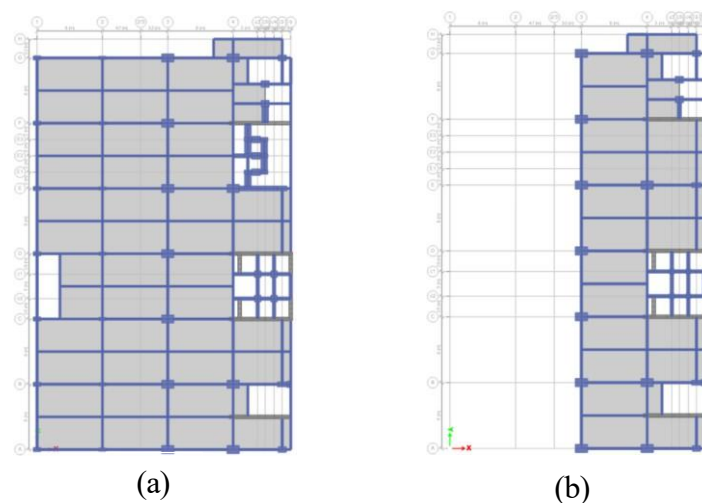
Plan: 5th Floor (a) and 6th Floor (b)
